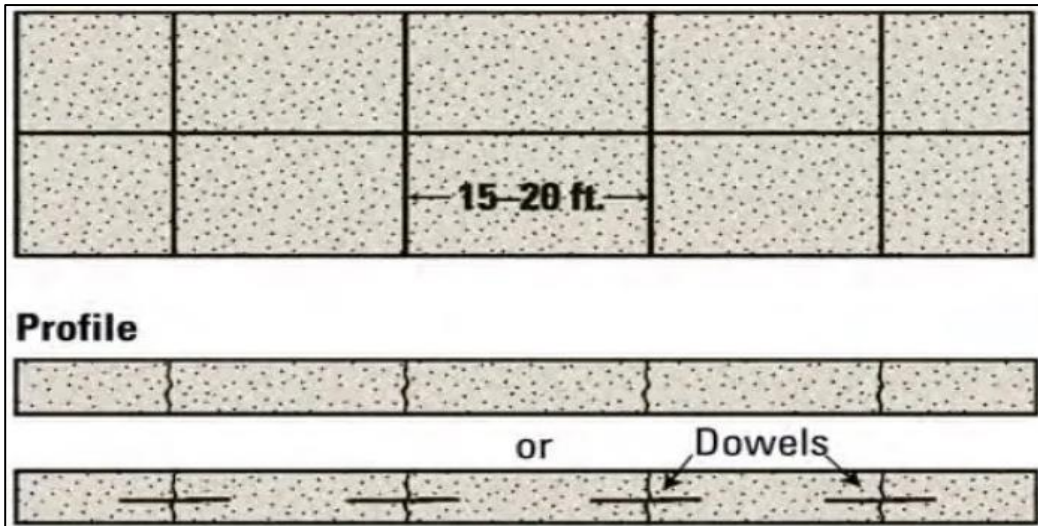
cross section of Joint Plain Concrete Pavement (JPCP)
